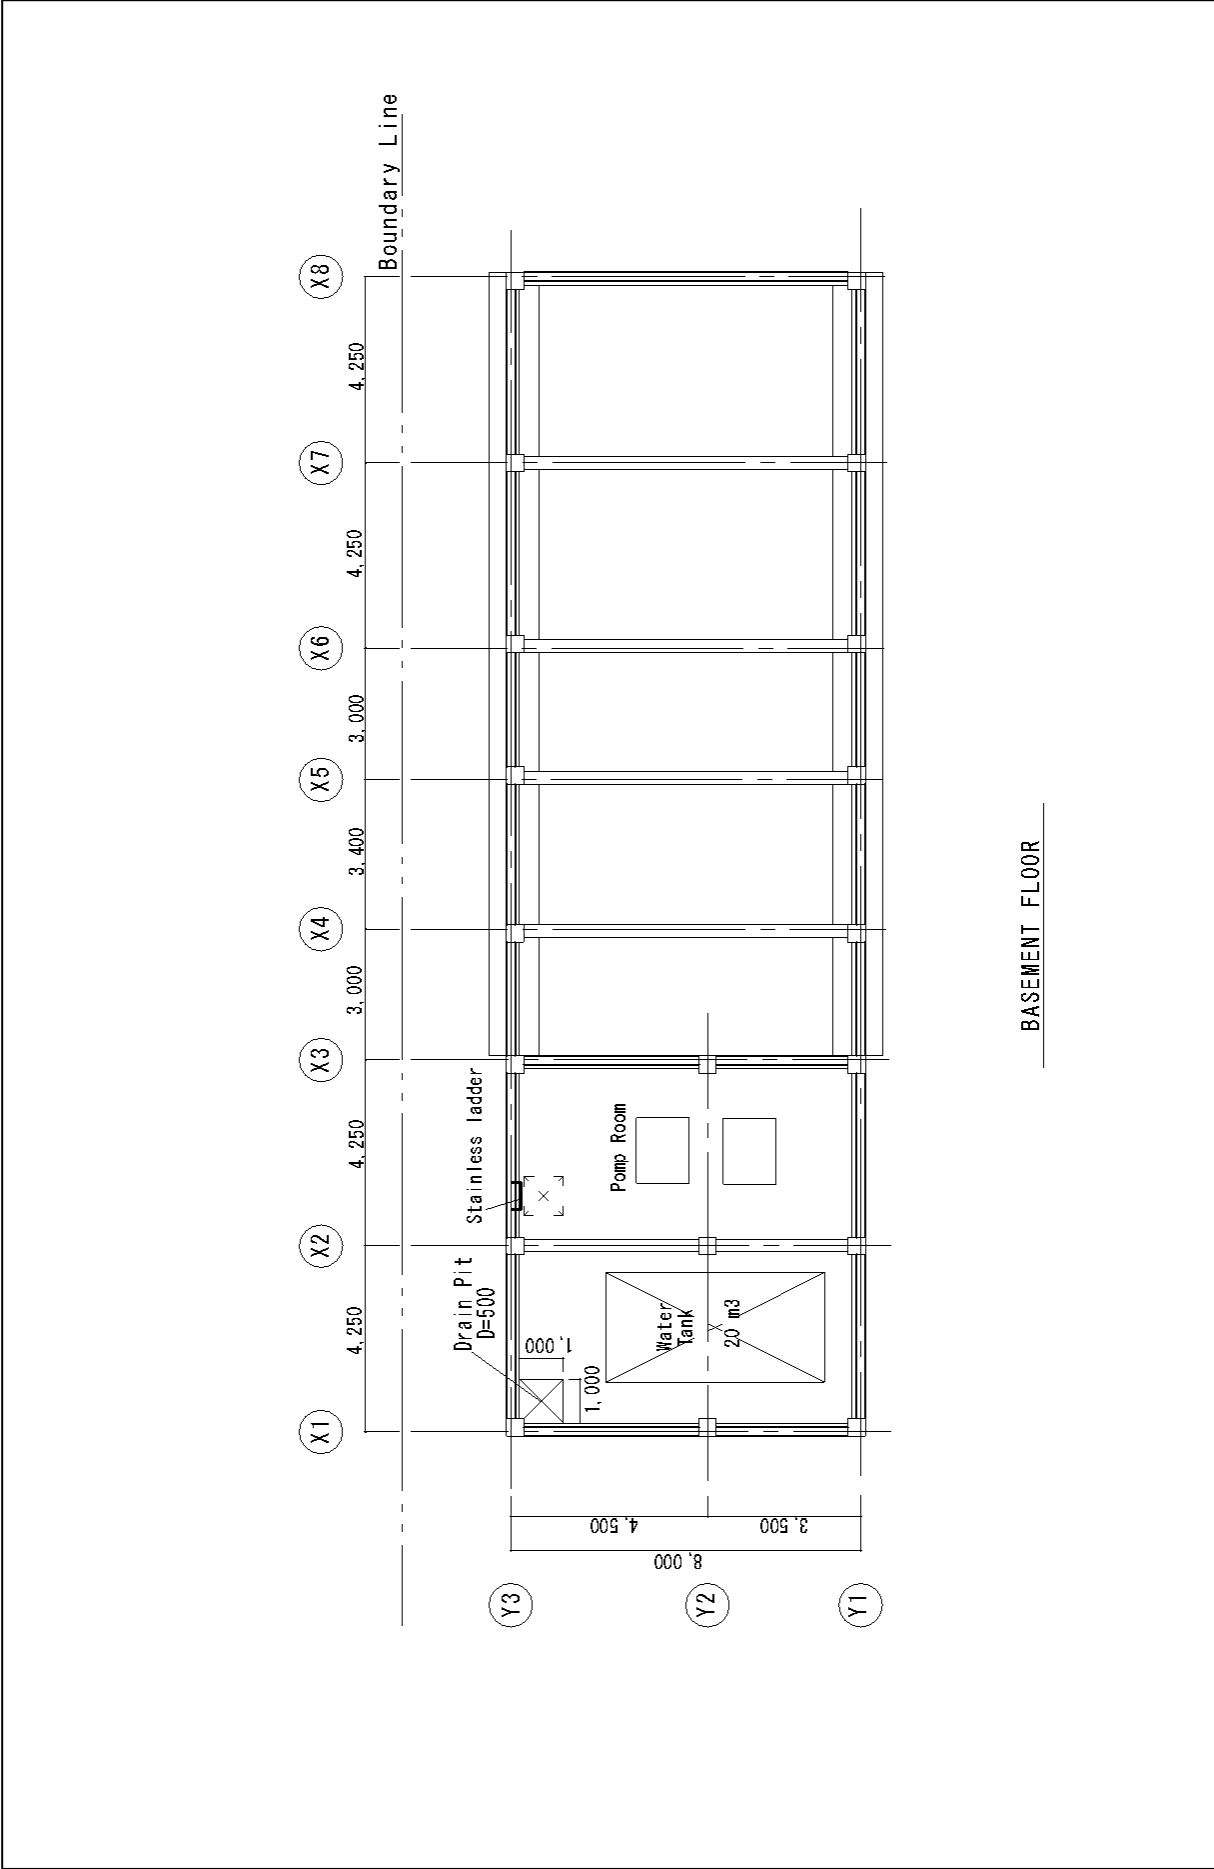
(7) Floor Plan of Fishery Complex (Basement Floor)
